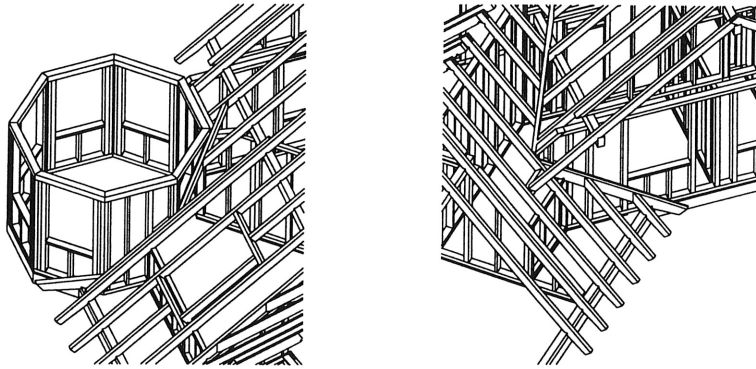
Intersection of the main roof with tower (left) and side roof (right).
